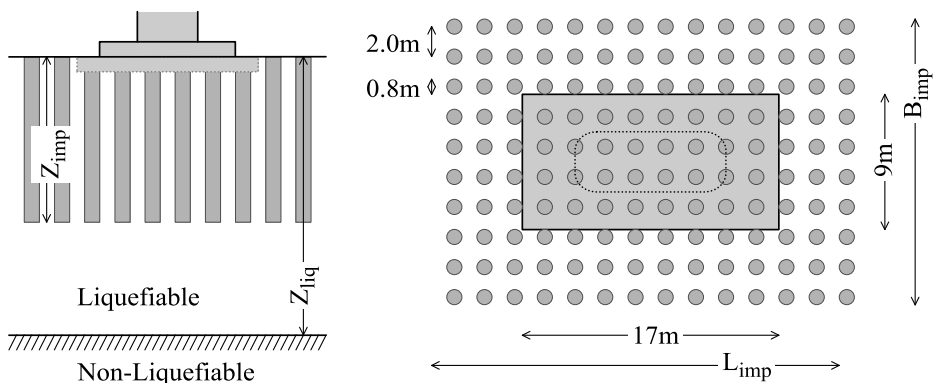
Cross section and plan view of the examined foundation and the proposed grid of stone columns, used for liquefaction mitigation.
